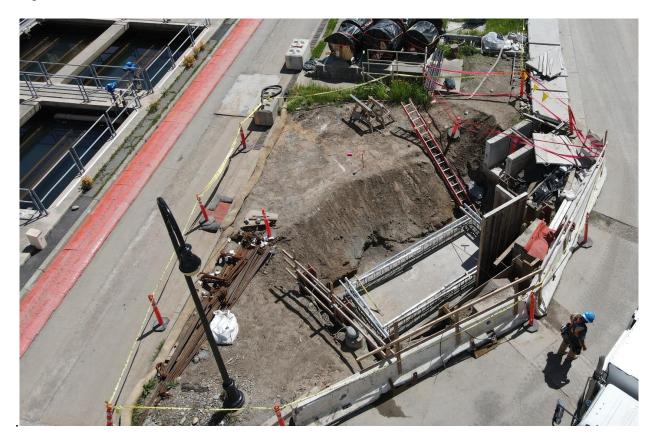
Aerial view of excavation and concrete foundation for the new chemical sump which safely contain chemical spills.
